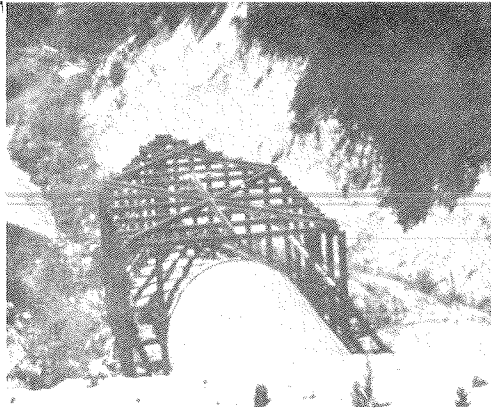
Steel rail debris deflector. Note storage area for debris resulting from culvert projection.
